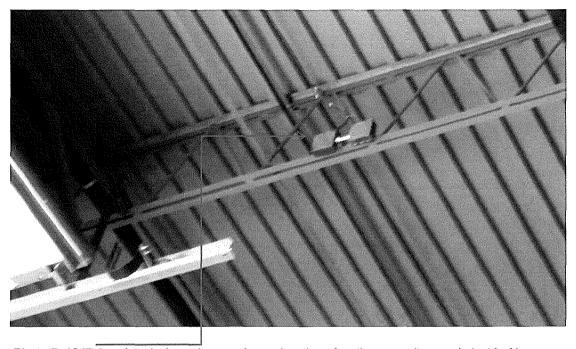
1247 Canal; typical warehouse - former location of methane monitors, red electrical boxese on ceiling truces, column BB16.
